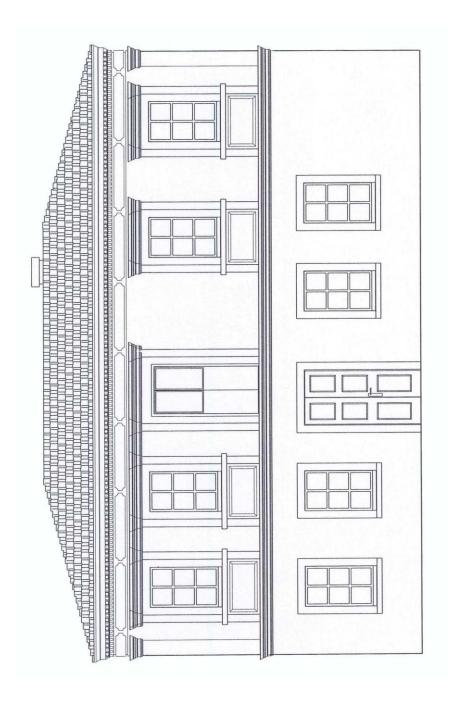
Front Elevation of 39-Türkkuyusu Street Scale: 1/75
